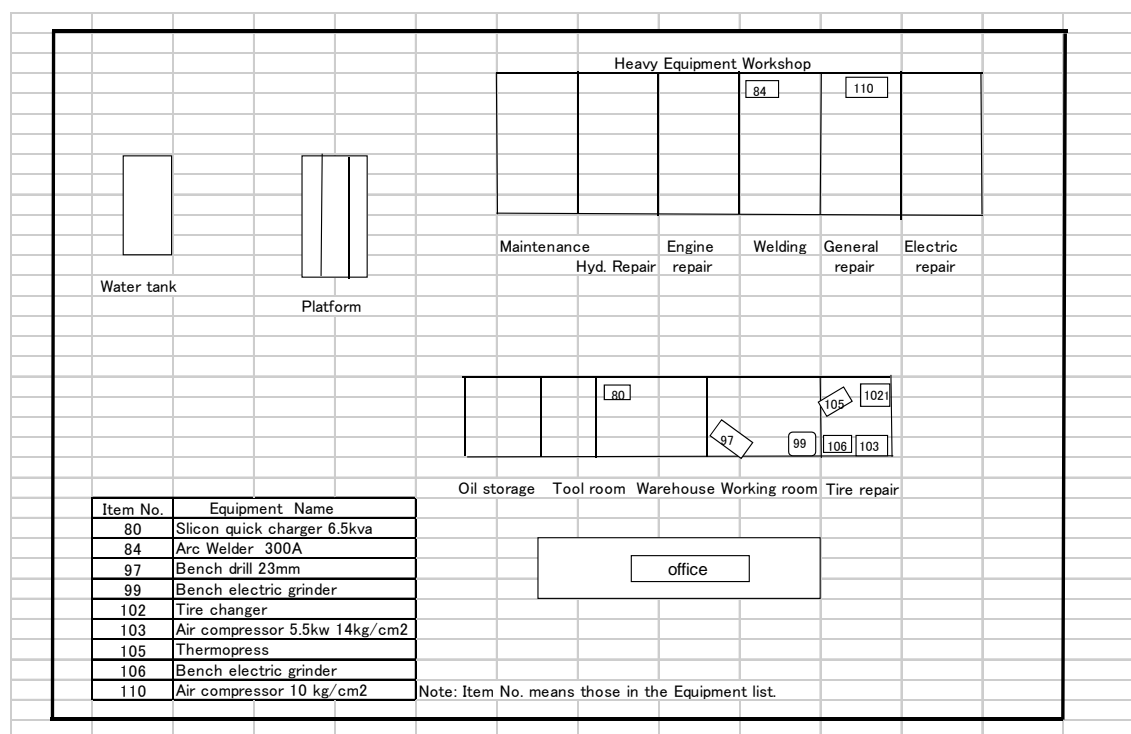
Jointly Designed Layout of Heavy Equipment Workshop
